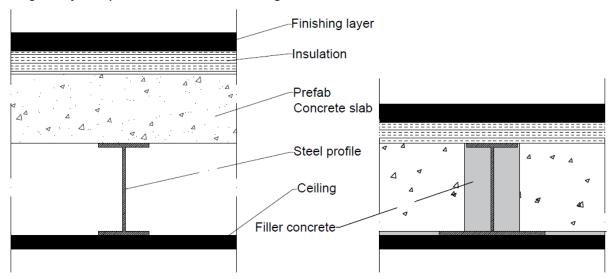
Stacked floor system and Integrated floor system (Designed by the authors)
